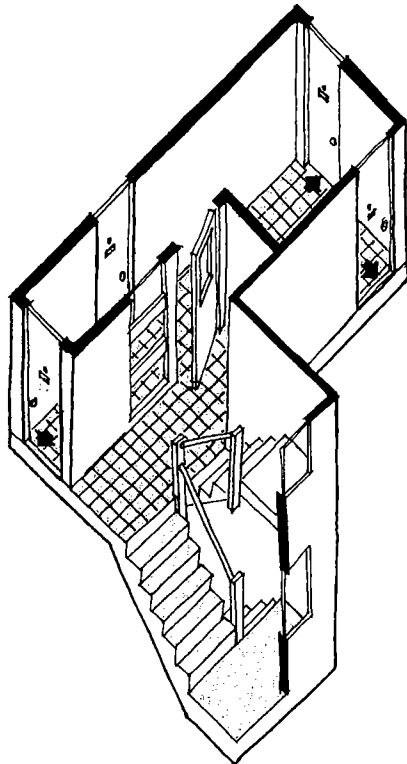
Interior Corridor at Breukelen Houses. Common corridor shared by four apartments in Breukelen Houses, a walk-up apartment building. The corridor follows this configuration so as to provide the necessary separation from the access stairs to meet fire codes.
